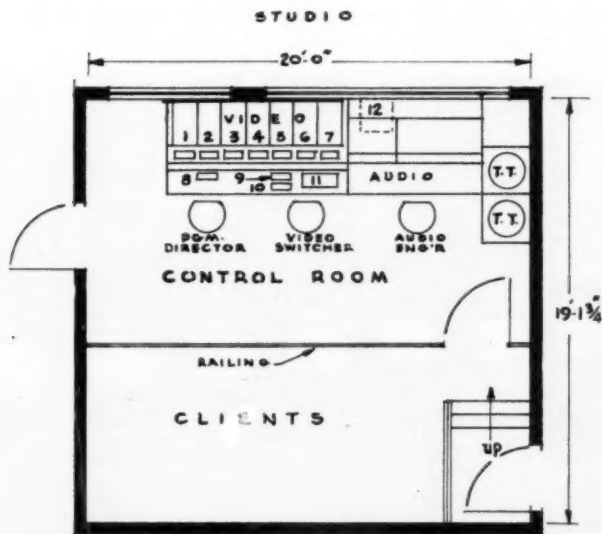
A. Typical floor plan of studio control rooms at 67th Street.
